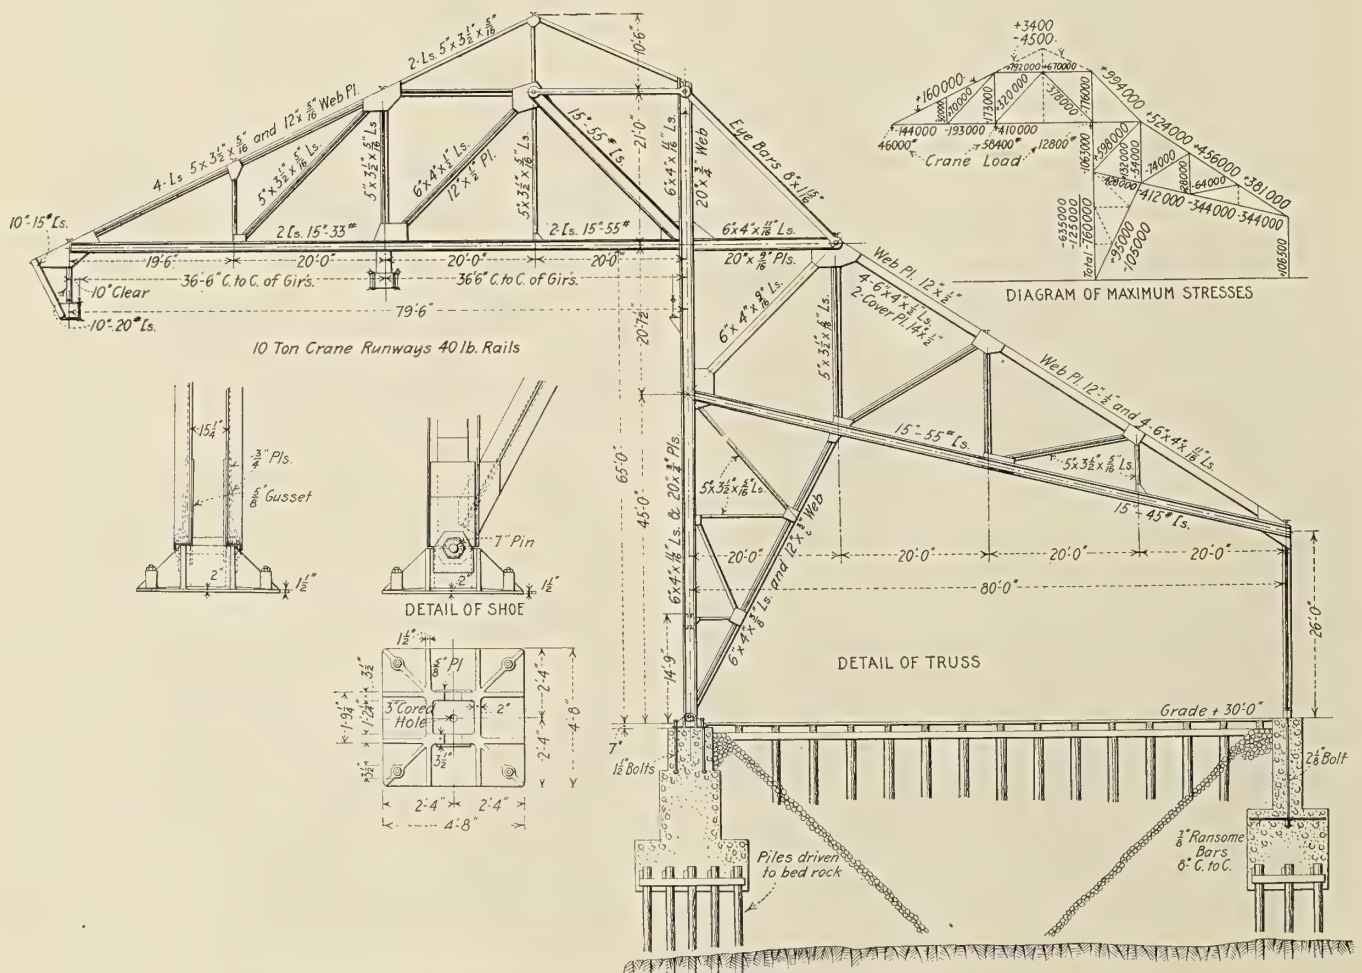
Structural Framing of Shipbuilding Shed, with Sketch Showing Maximum Stresses on Structural Members
